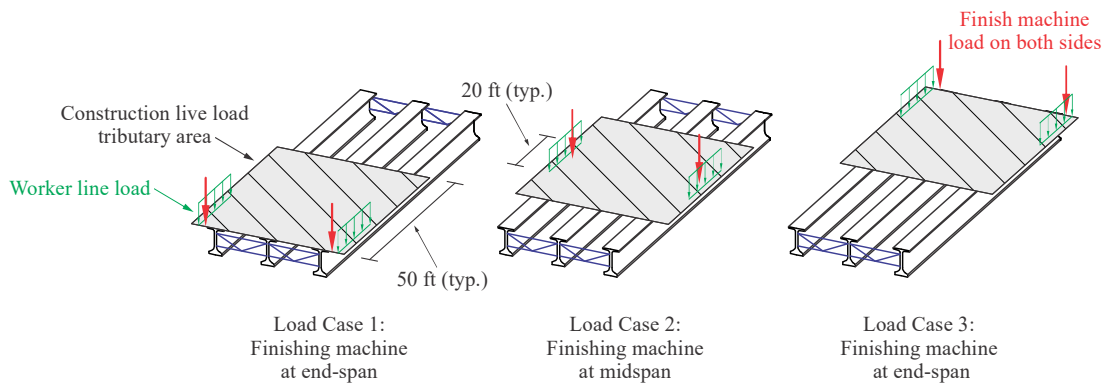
Construction *Load Group 1* as a function of finishing machine location (Bridge with only end-span braces; no interior braces)
